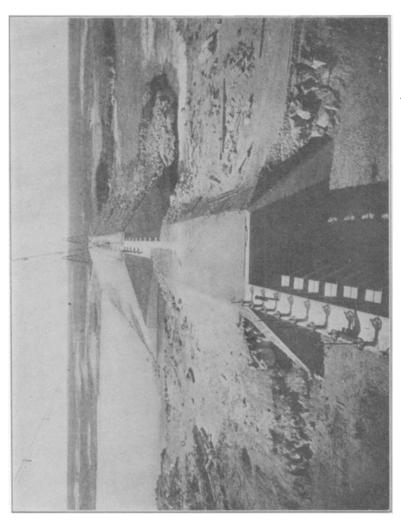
PLATE III.—Minidoka Dam, looking south. Diversion dam on Snake River, 50 feet high, showing towers and cableways, from which rock was placed. Gates of north side canal in foreground. Power units will be installed in the bays in main dam to develop about 10,000 horse-power from the water passing through to supply prior rights below.
